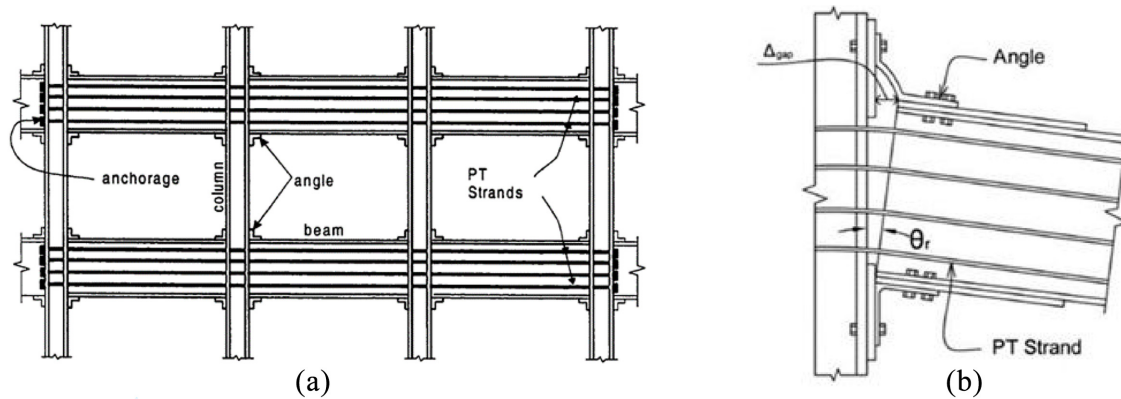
Details of structural elements: (a) seating and top angles of an SC steel frame with post-tensioned cables and (b) an open external connection of the frame (Garlock et al., 2005).
